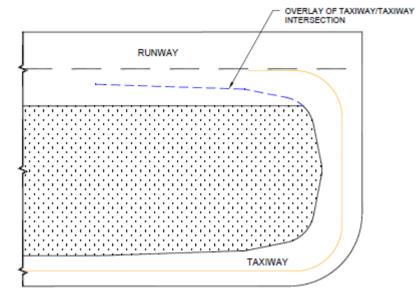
RIGHT ANGLE ENTRANCE CONFIGURATION WITH ROUNDED OUTER PAVEMENT EDGE
